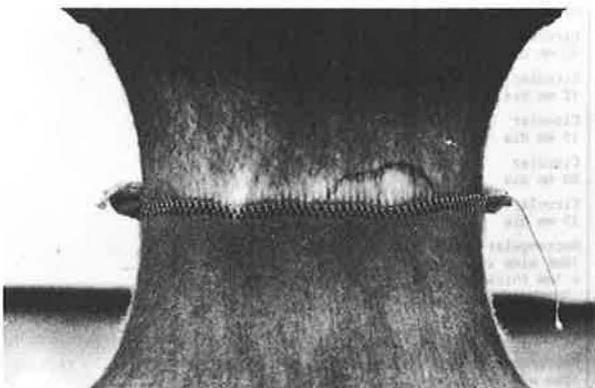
SEWN JOINT - GEOTEXTILE 'B'
